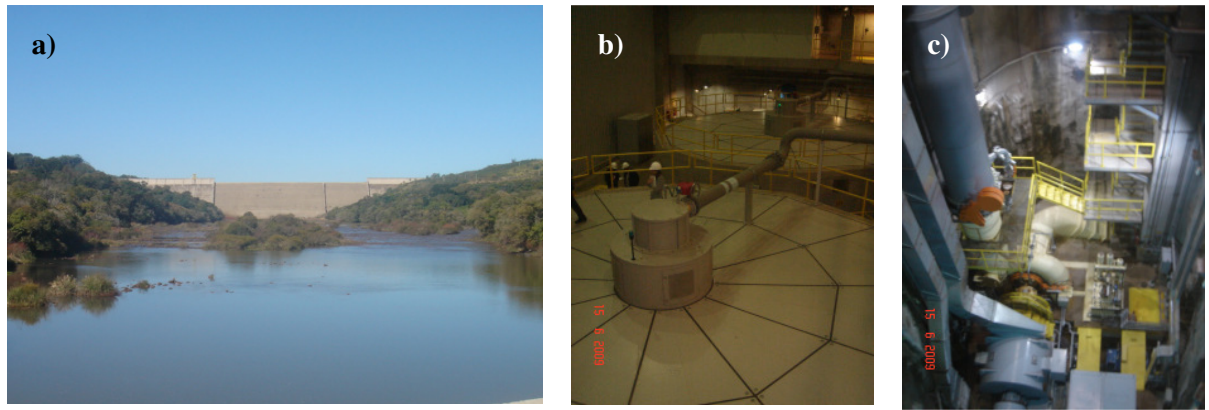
Santa Clara* Complex. a) Dam of the Large Hydropower Plant *Santa Clara*, b) Large Hydropower Plant *Santa Clara* powerhouse and c) Small Hydropower Plant *Santa Clara I* equipment.
